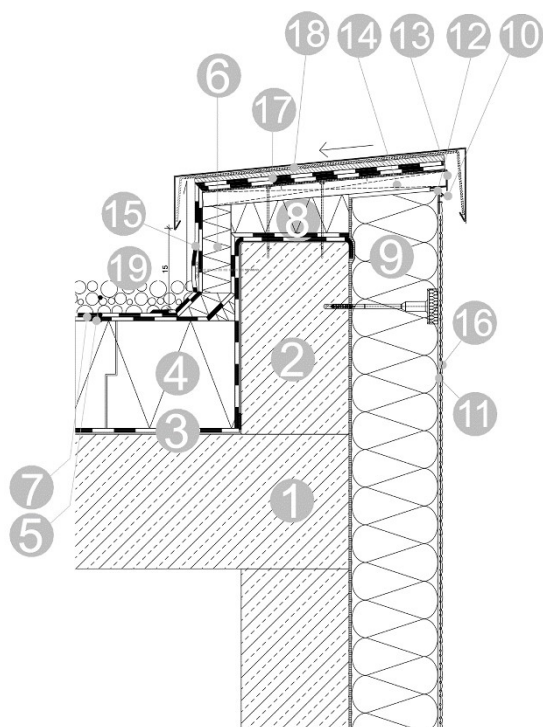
Standard Austrian flat roof parapet with ETICS facade detail.
